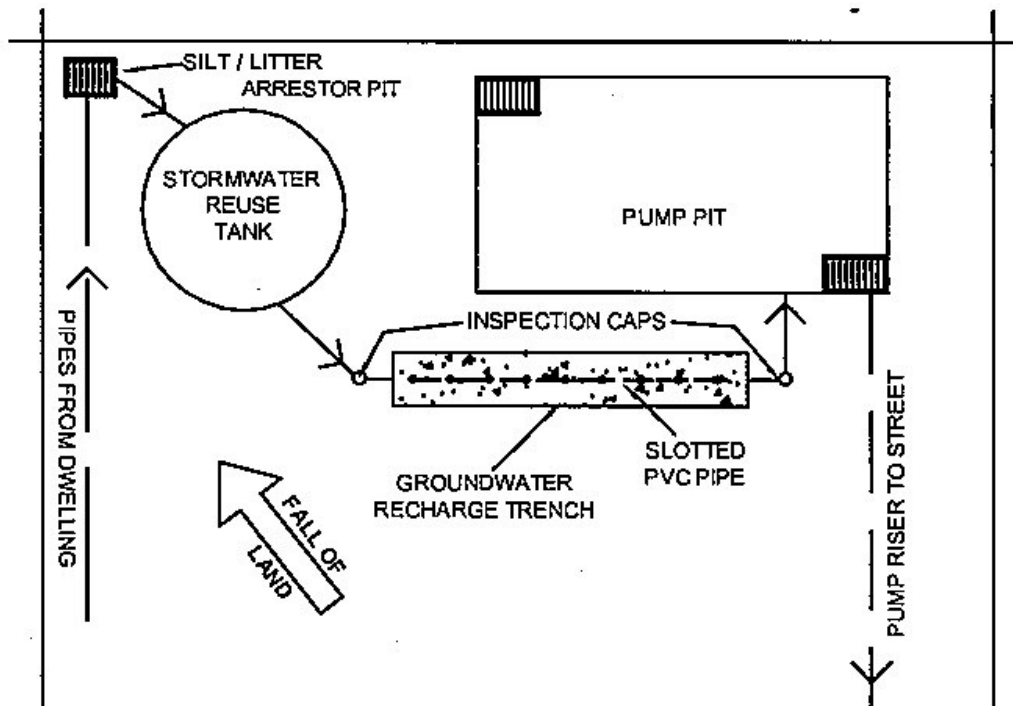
Groundwater Recharge Trench Layout, Fall to Street
